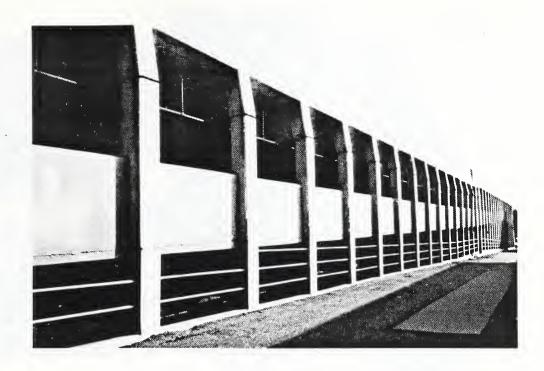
A damaged reinforced concrete parking garage at the Whittier Quad shopping center. Deep beams at the columns slant toward the inside of the structure due to the loss of support at the other side.
